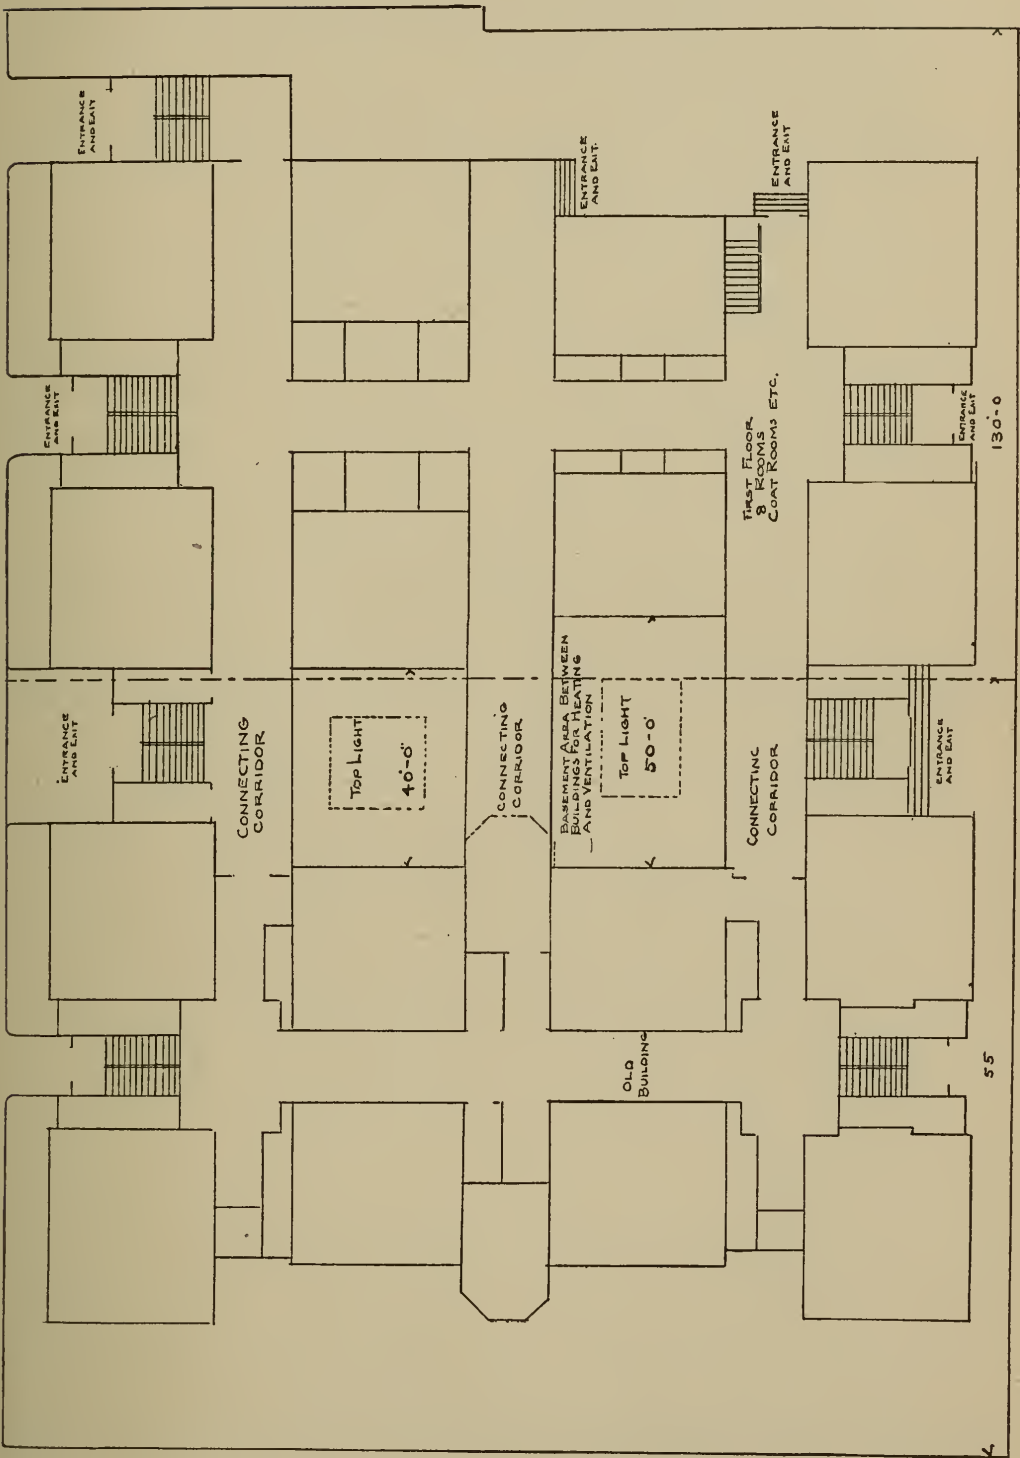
shows four additional school rooms with the gallery of the hall referred to in No. 3.
